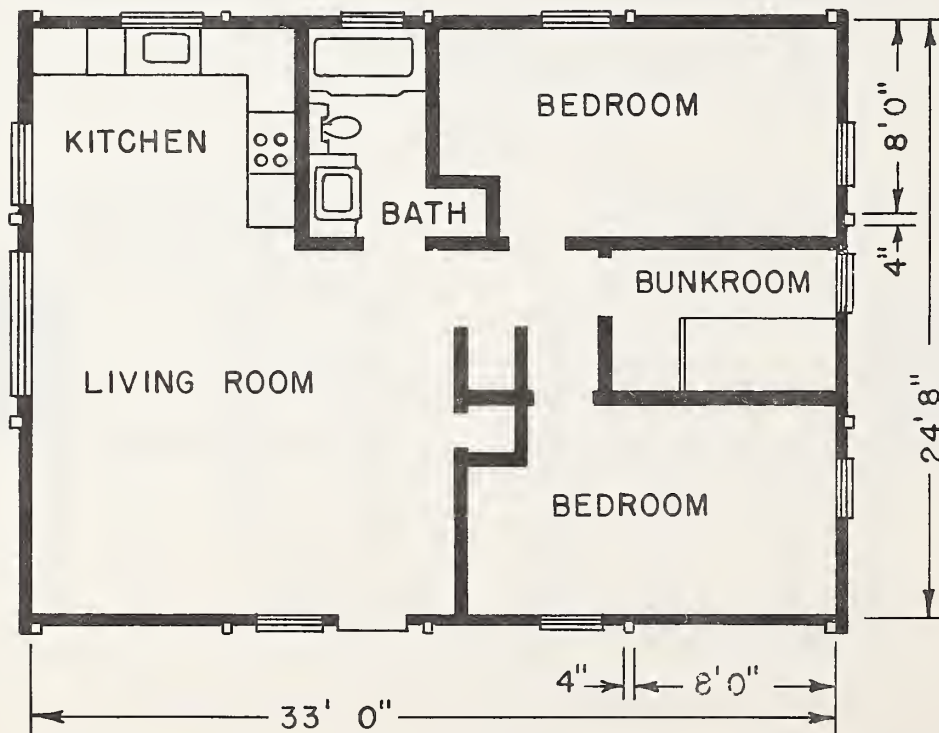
Floor plan of the house used for testing the crawl-space plenum, Charles Town, W. Va.
